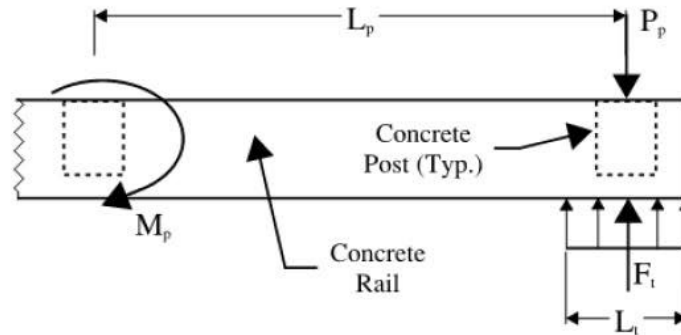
Single-Span Failure Mode for Post-and-Beam Railings at an End Section or Joint
